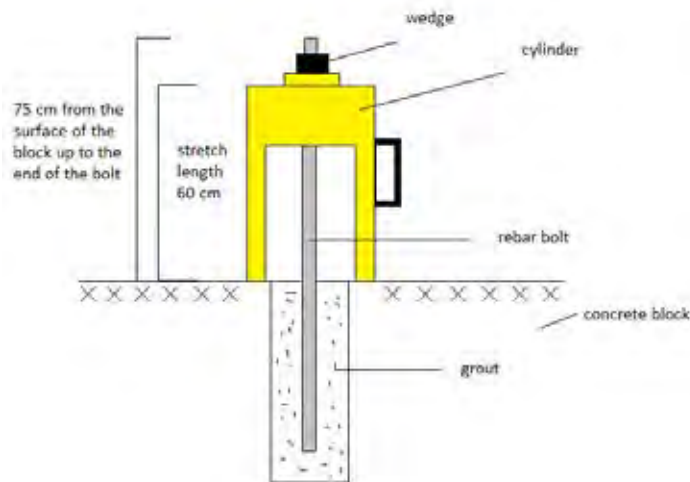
The pull-out test setup. Rebar bolt grouted in concrete block and hydraulic jack used to pull out the bolt. The tested stretch length is 60 cm.
